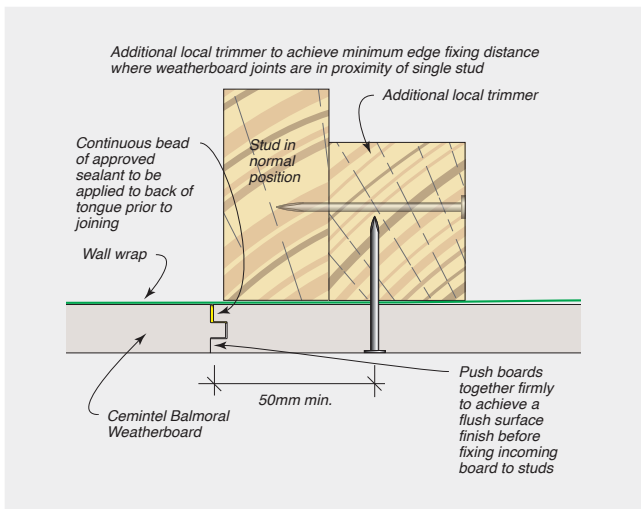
Typical Vertical Joint Aligned to Timber Stud with Local Trimmer
